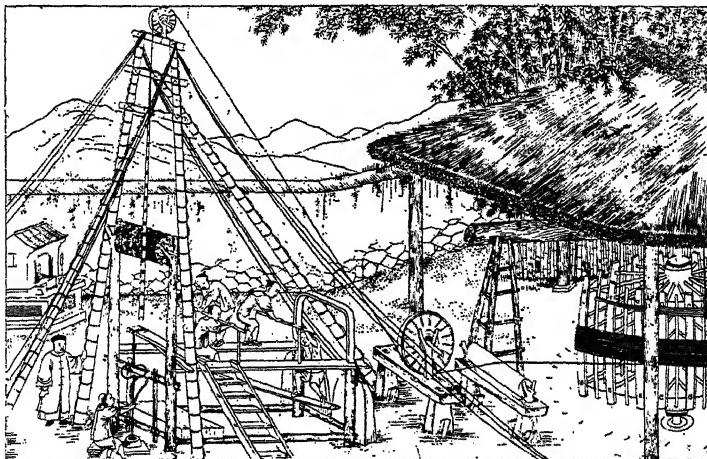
CHINESE DRILLING METHOD PER COLDRE. REGULAR DRILLING OPERATIONS.
